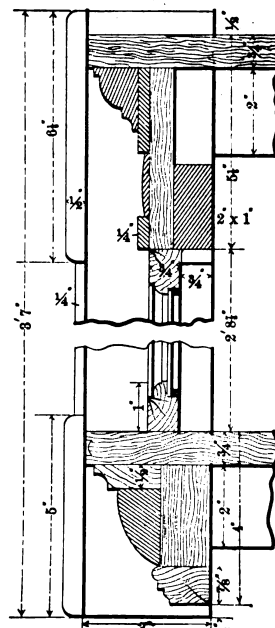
Section of Cornice.—Scale, 3 Inches to the Foot.
